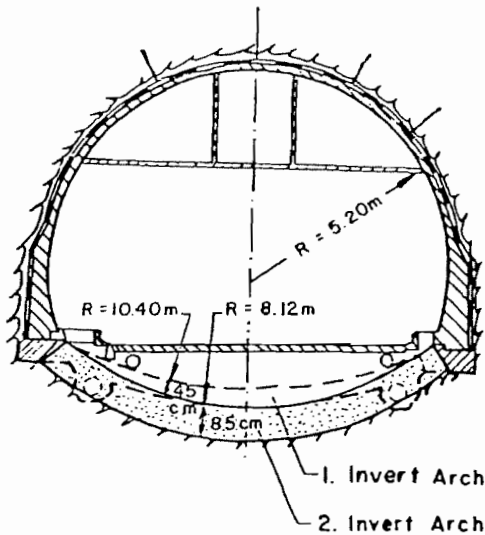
Belchen Tunnel. Cross section with original (1.) and reconstructed (2.) invert arch (from Grob, 1972).
